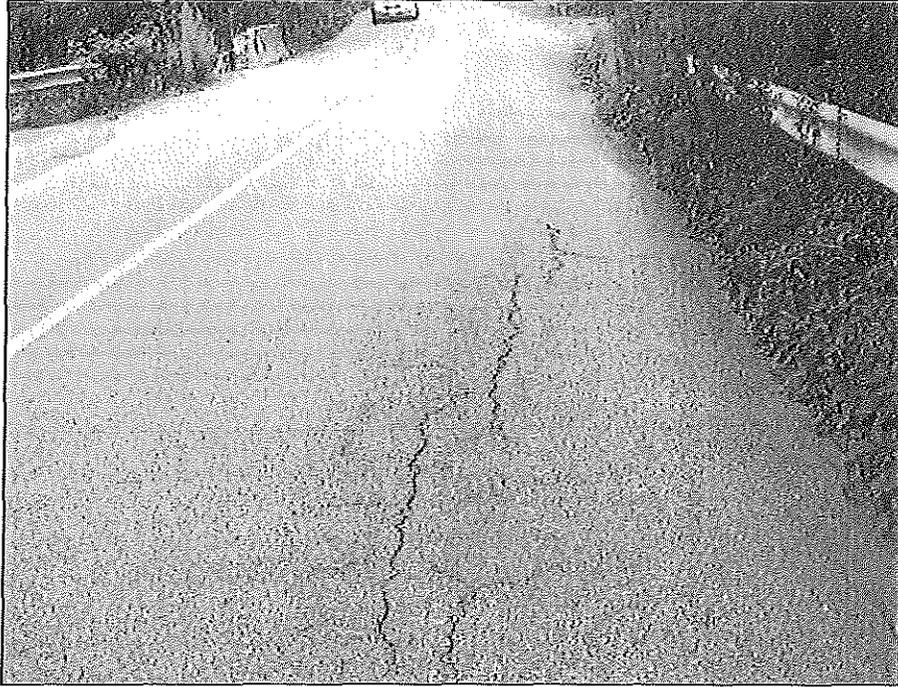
Longitudinal crack in wearing surface at northwest wingwall
